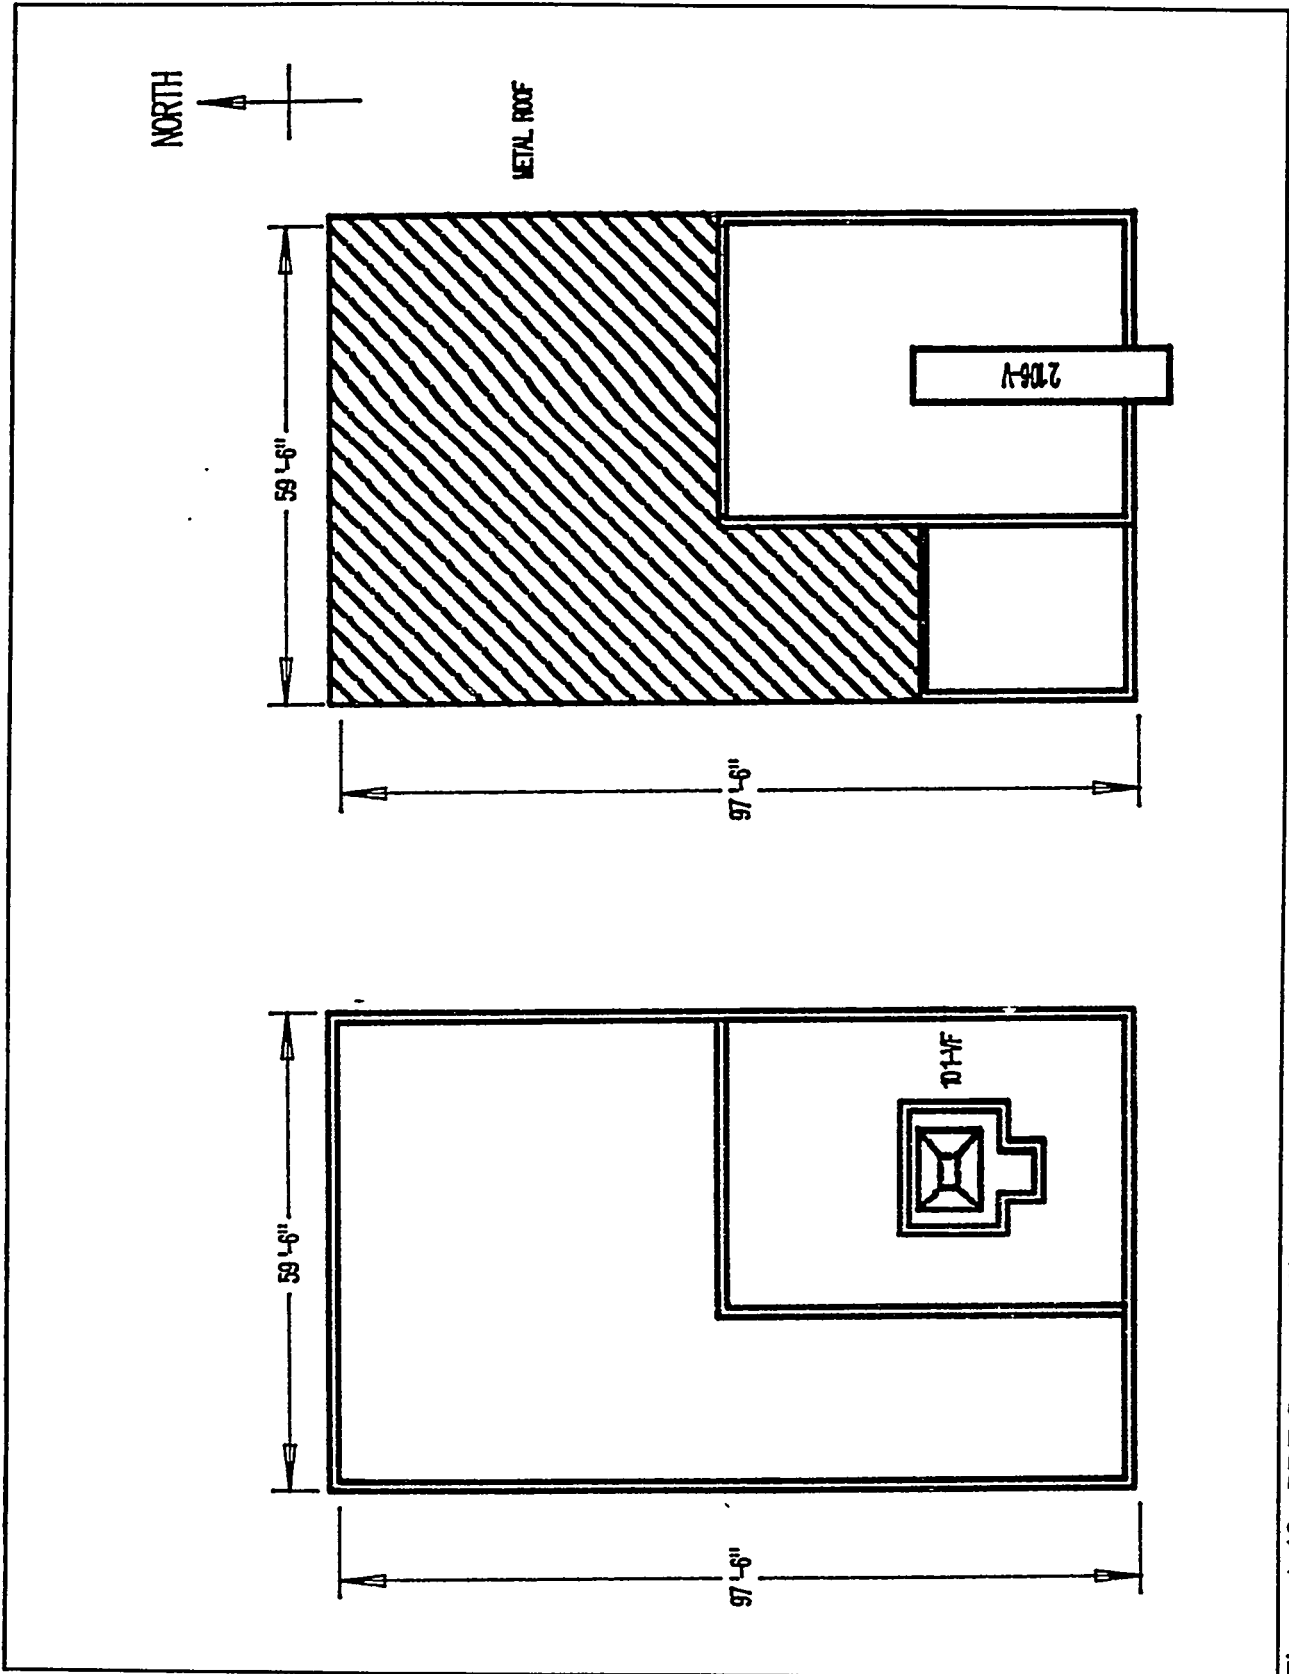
PDF Structure Floor Plan (Elevations 260'-6" and 279'-2")
